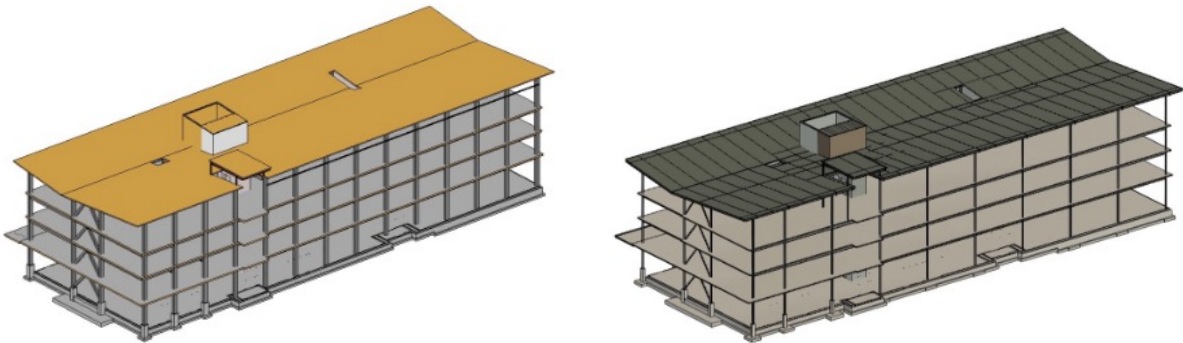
Schematic 3D images of the two alternate buildings—mass timber (left) and steel (right)
